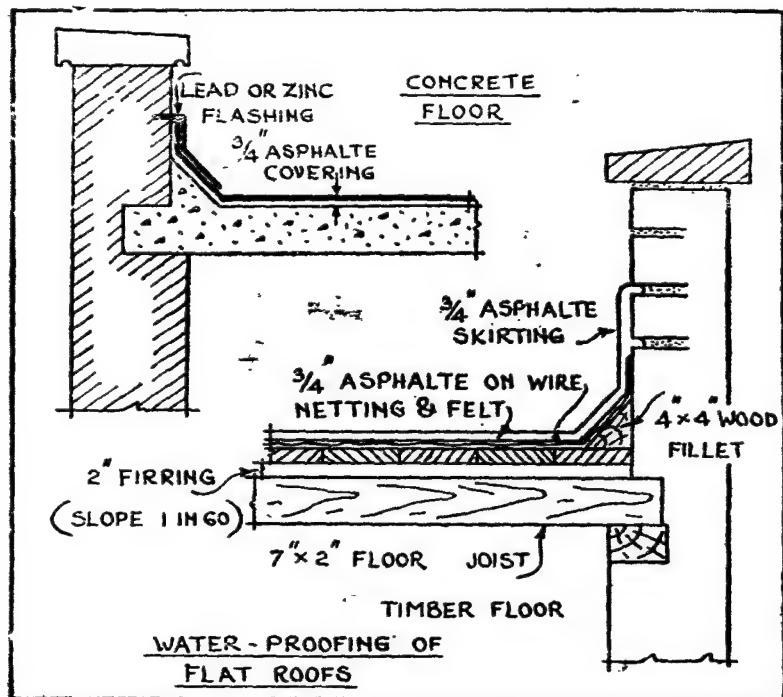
$\frac{3}{4}$ " asphalt water proofing layer for an R. C. C. roof.
